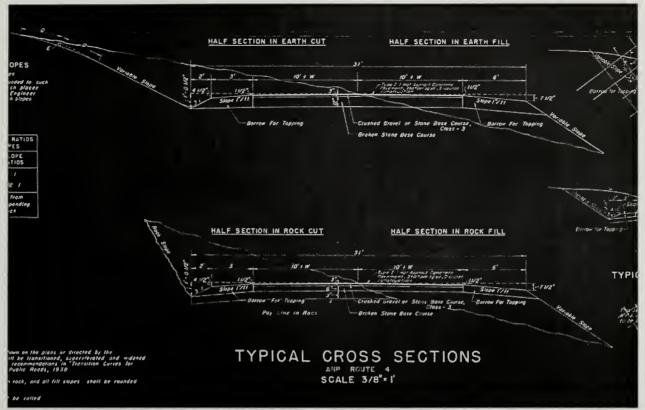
Cross-section diagram for Bureau of Public Roads Project 4A2, 1956, showing a 31-foot cross-section that includes a 20-foot traveled way, a 3-foot shoulder in cut, and a 6-foot shoulder in fill. (U.S. Department of Commerce, Bureau of Public Roads, Project 4A2, Sheet 2 of 24, April 1956)
